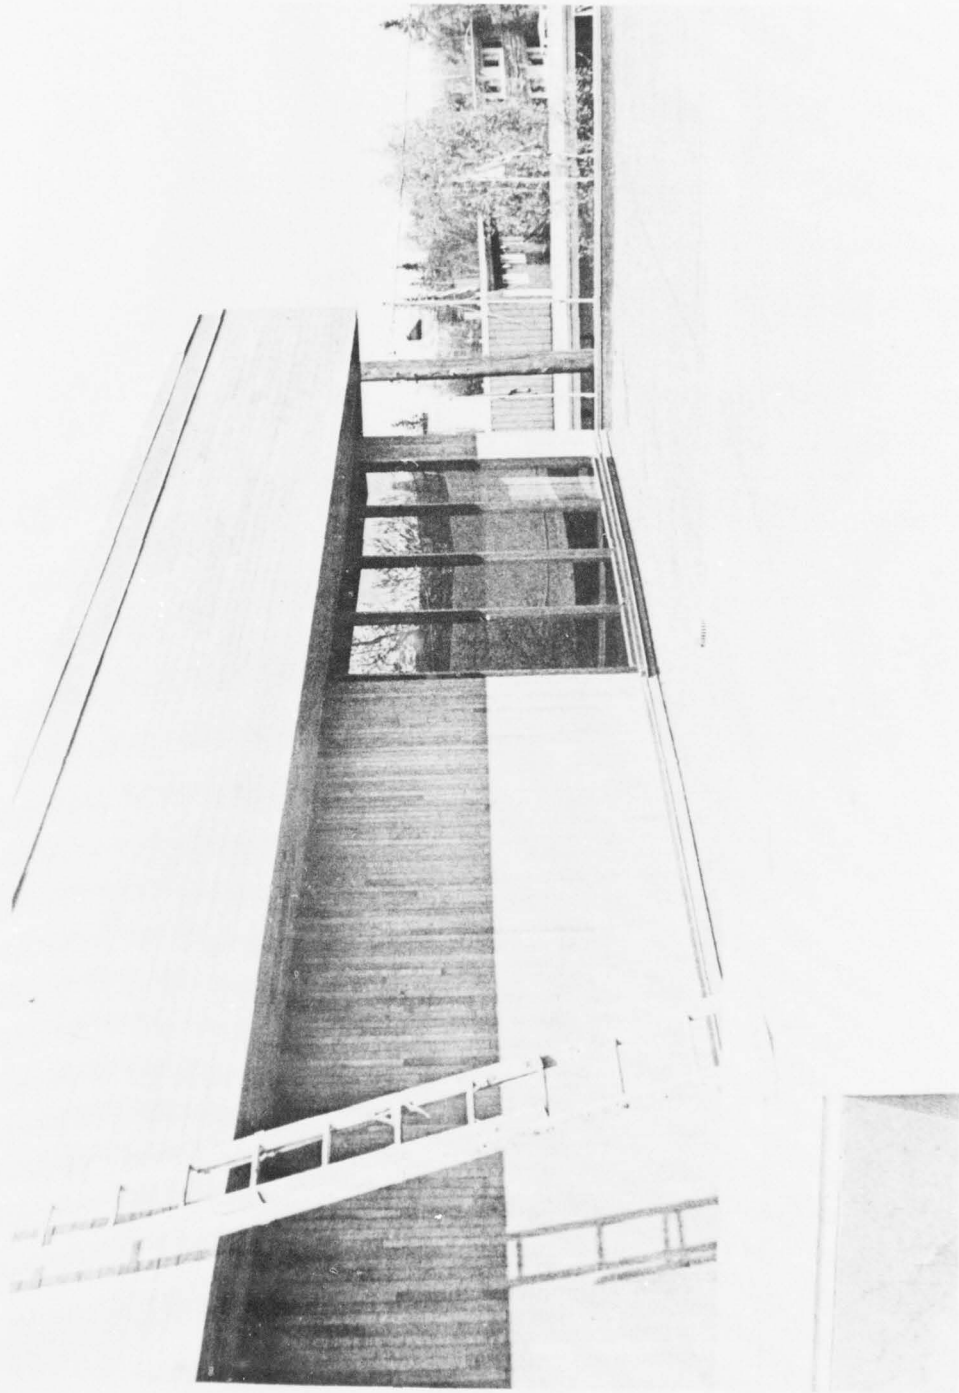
Addition Portion of Building, From Old Roof, Looking Northeast, 11 May 1978.
